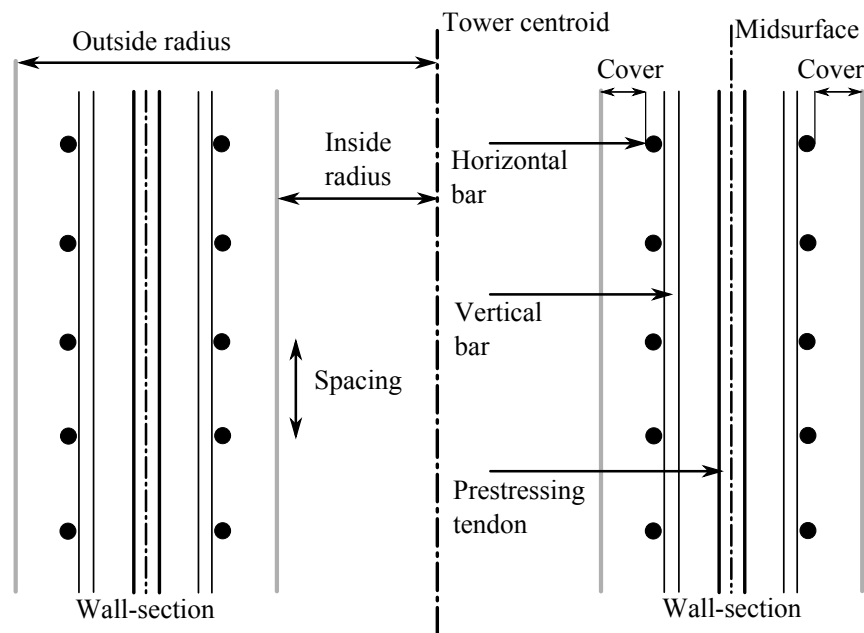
Placement of nominal and prestressing reinforcement in the tower wall (N.T.S).
